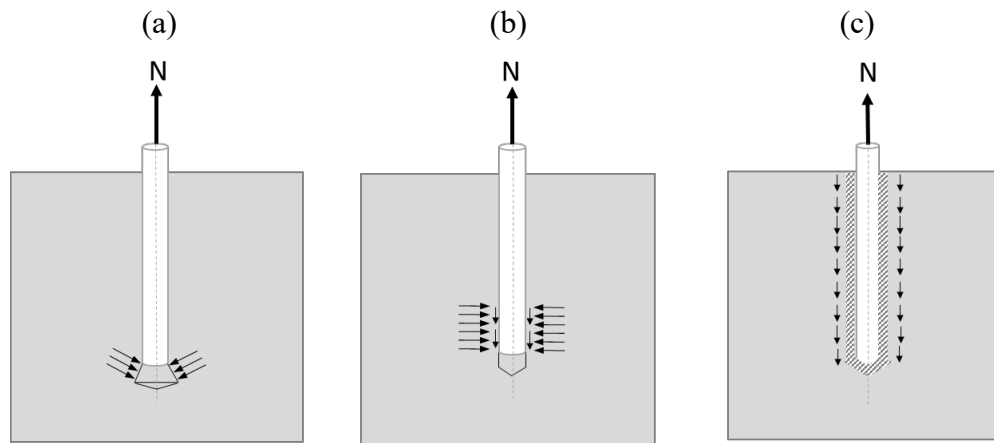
Transfer Mechanism (a) Mechanical interlock (b), Frictional interlock and (c) Bond (redrawn from (Eligehausen, 2006))
